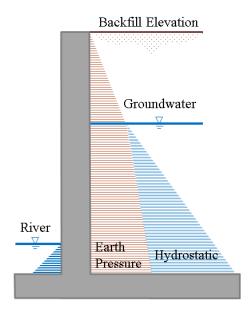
Typical Lateral Pressures Acting on a Retaining Wall
